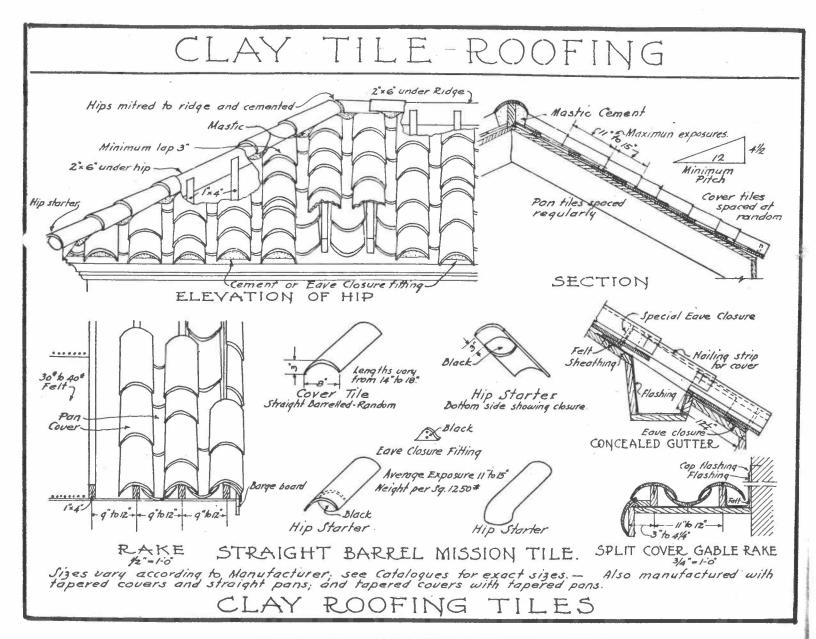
CLAY TILE ROOFING (ABOVE)
